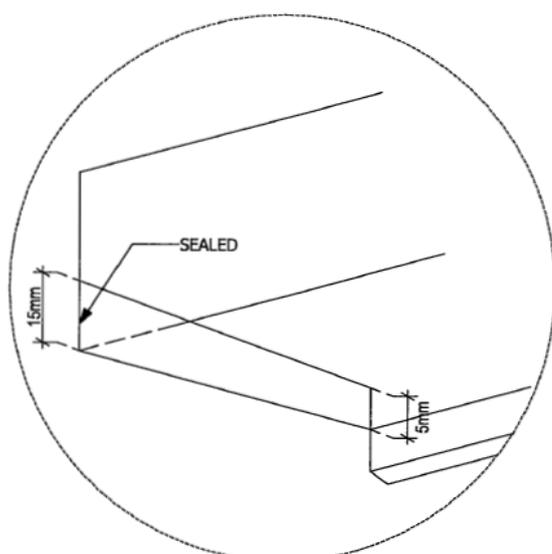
Detail of the head flashing stop end as constructed (not to scale)
